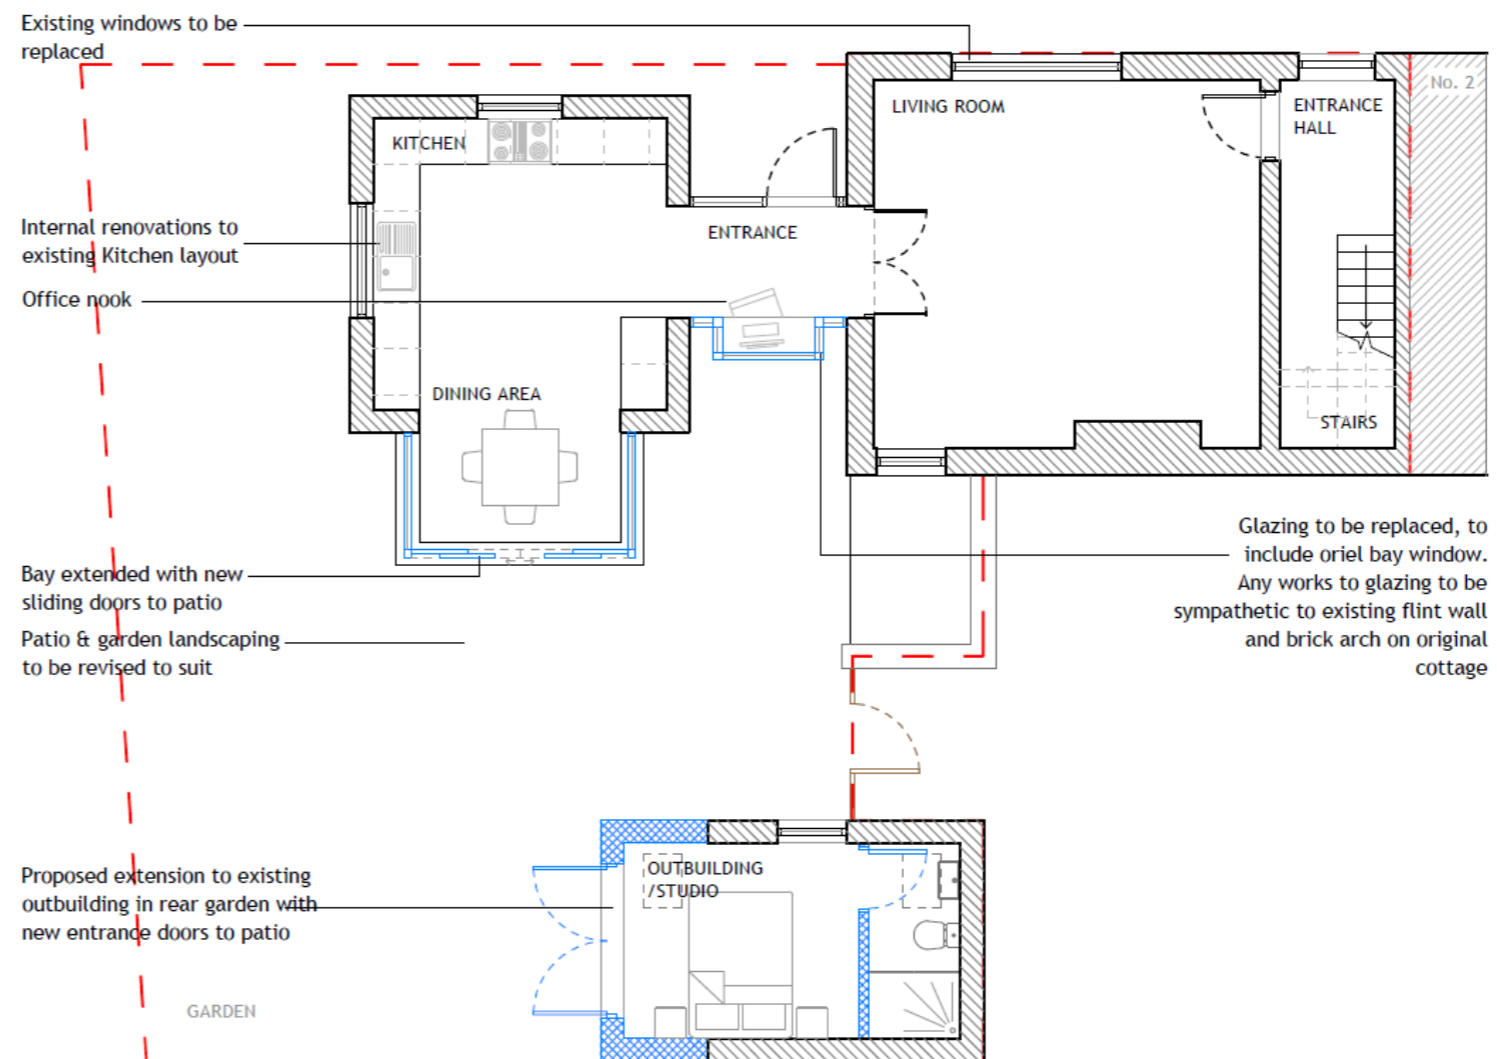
Proposed Floor Plan (as per the Pre-Application Enquiry - not to scale)
